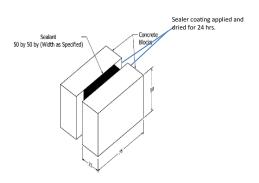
Concrete Block Test Specimen) ASTM D 5329 (1)
